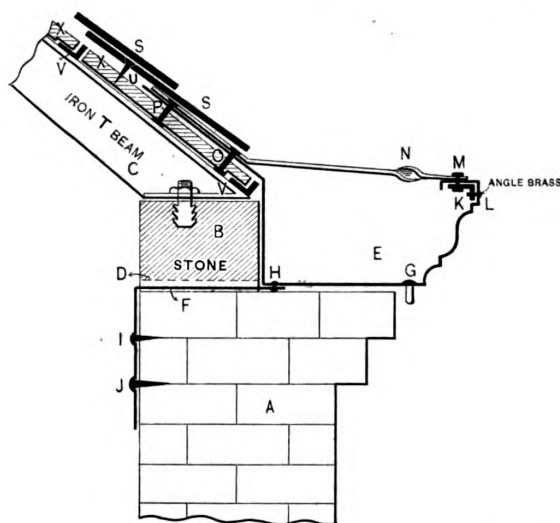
Fastening Metal Gutter on Brick Wall and Terra Cotta Roof.
